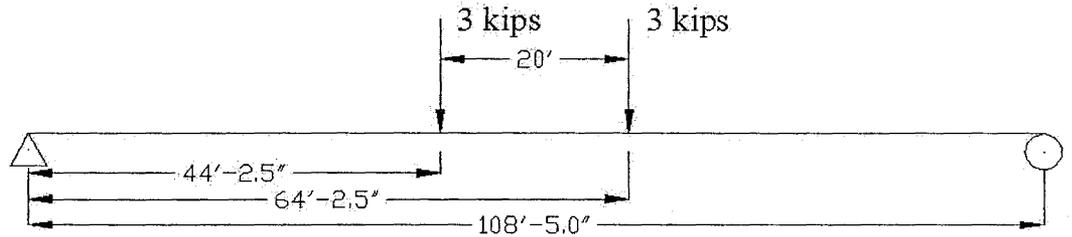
Location of interior diaphragms on a simply supported bridge girder.
